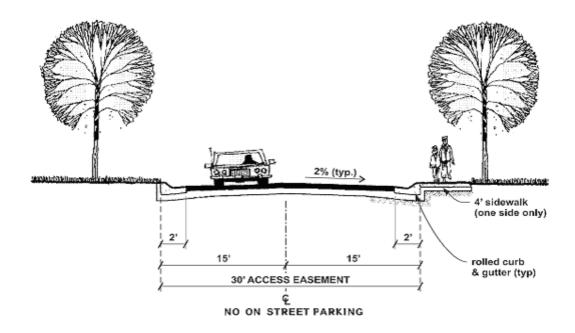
Unit I (Multi-Family) Residential Street Section (Private)
